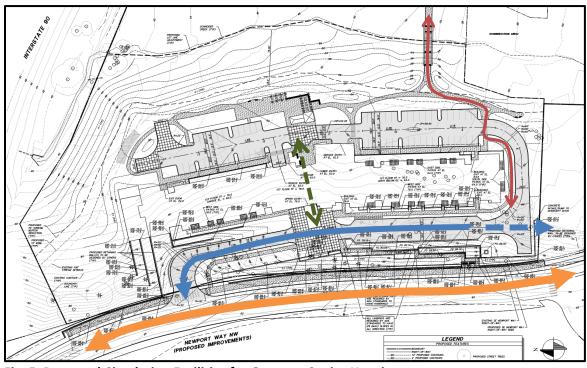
Proposed Circulation Facilities for Gateway Senior Housing
